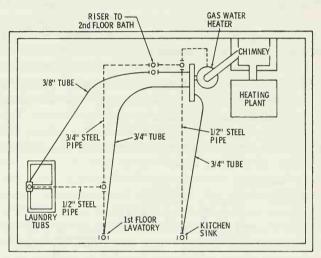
A comparison between the standard iron pipe or steel pipe and a copper tubing installation; by using the tubing, the distances between the water heater and the various faucets can be substantially decreased; thereby decreasing the heat loss in the stored water.
